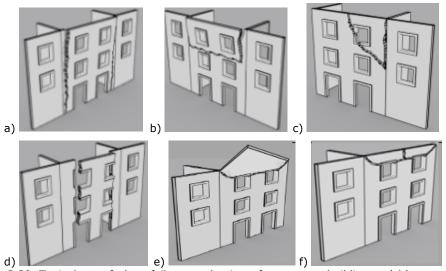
Typical out-of-plane failure mechanisms for masonry buildings: a),b) overturning because of lack of connection, both sides; c) overturning in correspondence of the piers; d) overturning due to lack of connection, one side; e), f) arch failure; [191]
